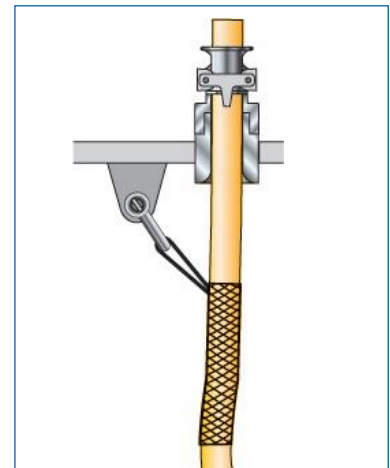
c: Cable suspension and cable entry into discharge tube
